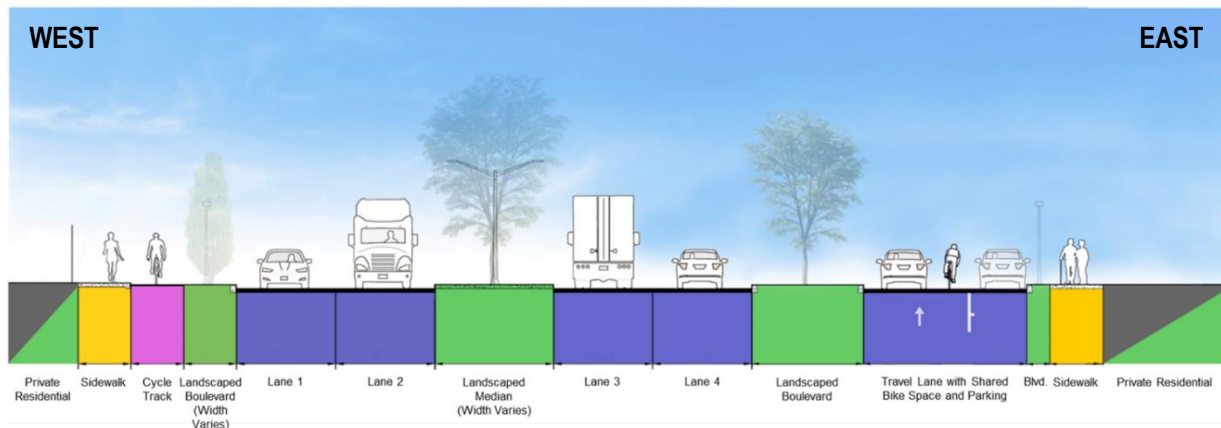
Concept for Montée-Paiement with Frontage Road (Boulevard Maloney to Boulevard la Vérendrye Ouest)
